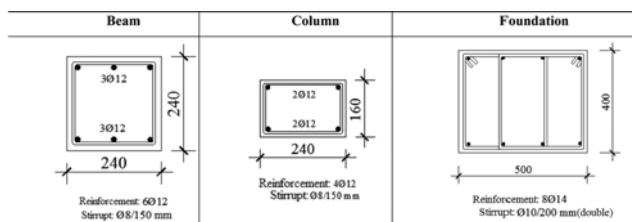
Cross-section and Reinforcement Details of Test Frame Members
